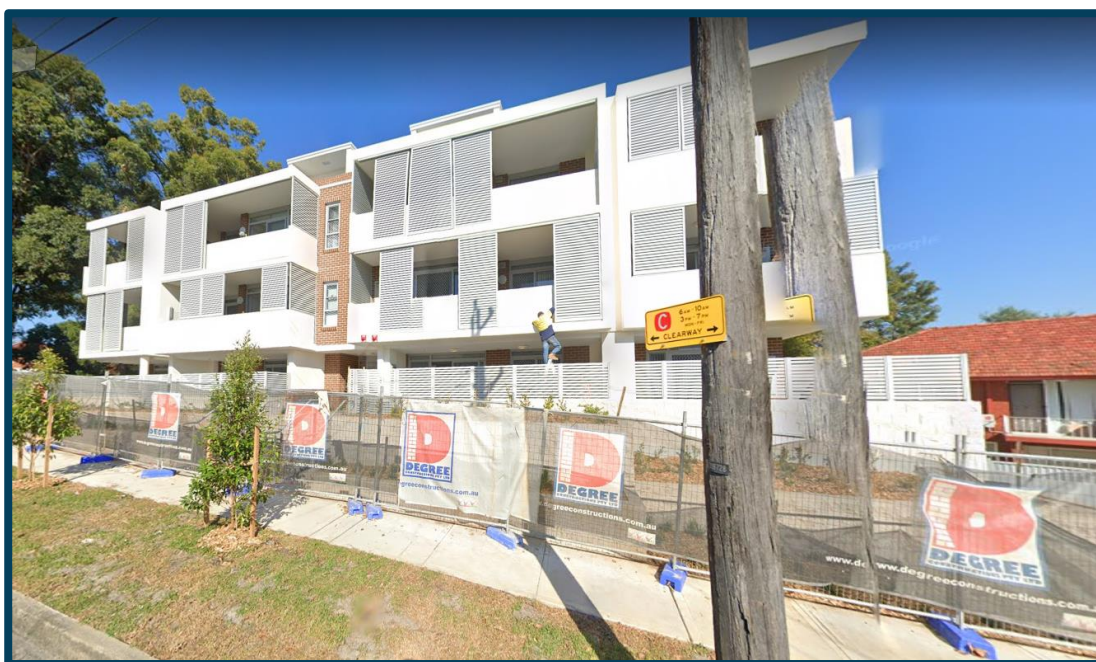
Land to the south (84 New Illawarra Road and 313 Bexley Road, Bexley North) from Bexley Road looking south west (Source: Google Streetview)
